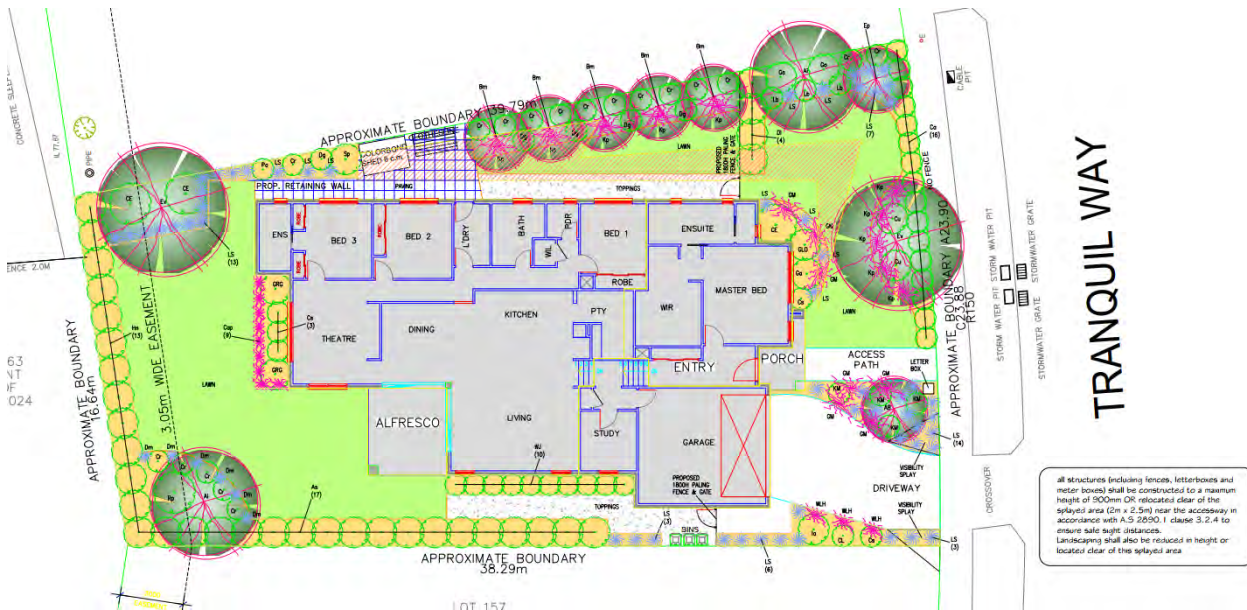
Proposed Landscape Plan (Source: Monarch Garden Design, revision A).
